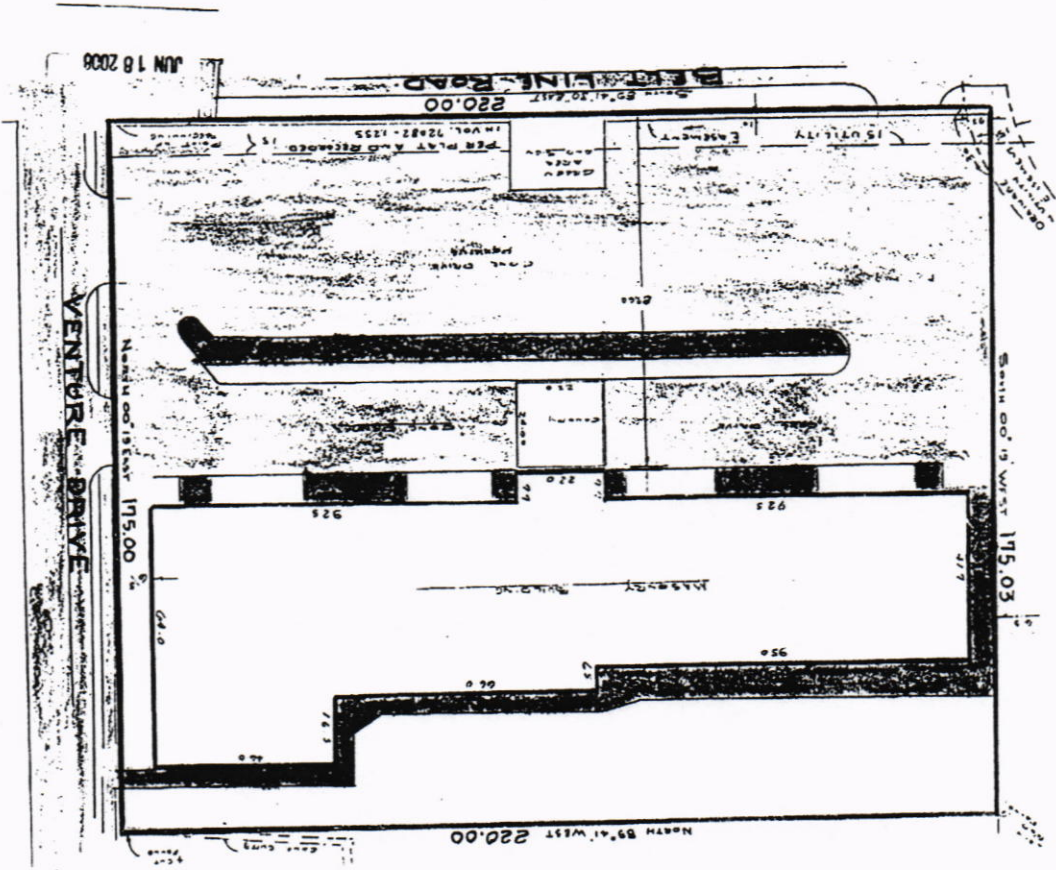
Exhibit B- Floorplan of 3604 Beltline Road – (Suite 200 highlighted and containing approximately 6,100 square feet)
